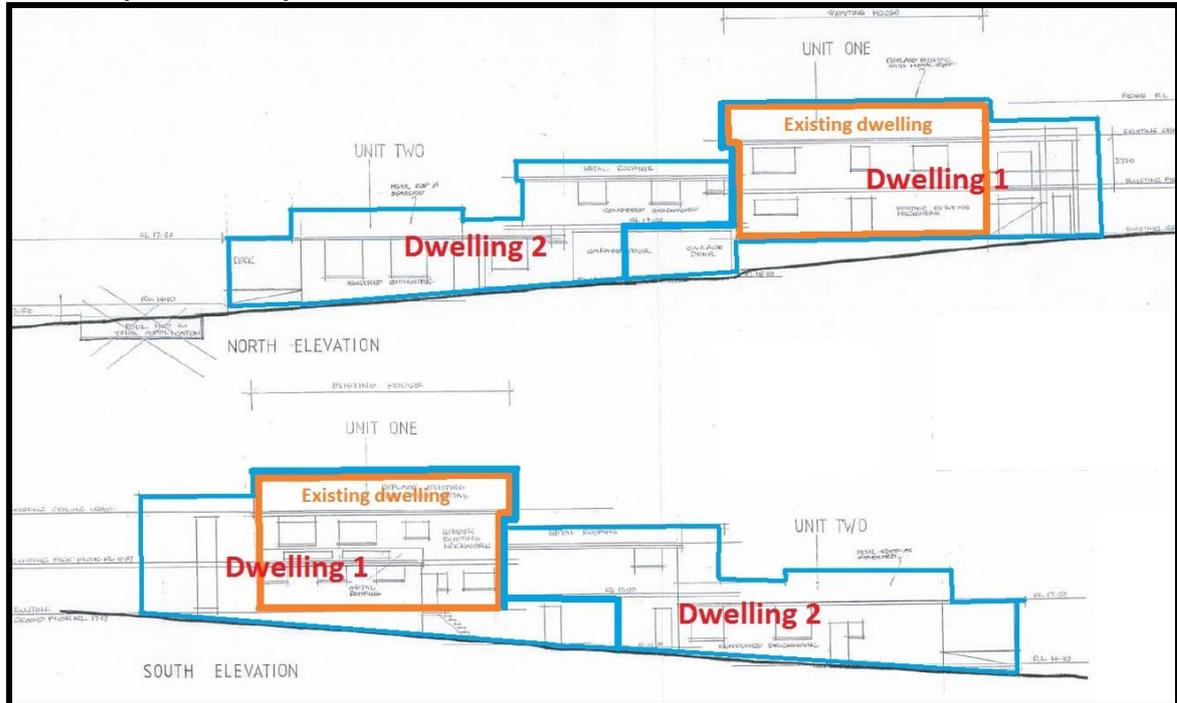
Extract of the North and South Elevation drawings of the proposed development with two (2) dwellings proposed highlighted in blue and labelled in red. Highlighted in orange is the existing dwelling that is the subject of the proposed alterations and additions.
